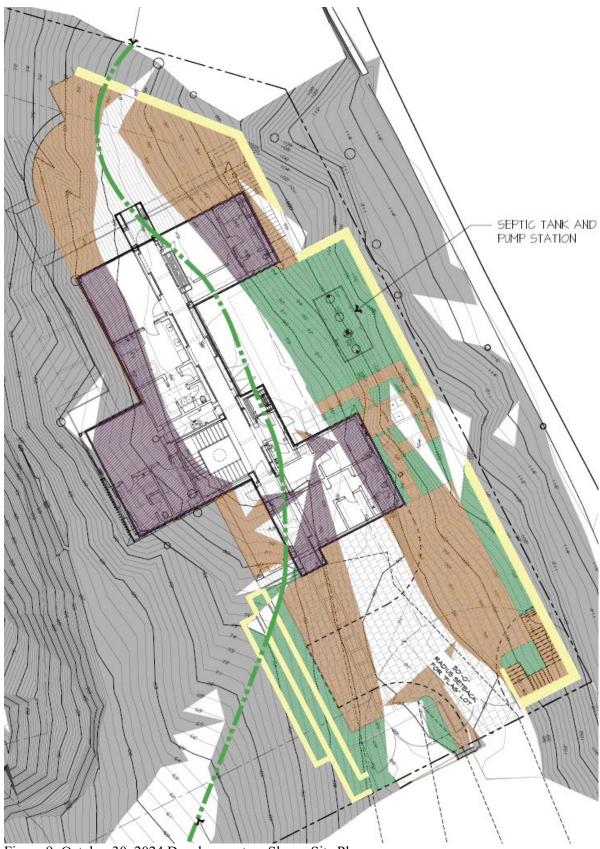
October 30, 2024 Development on Slopes Site Plan.
